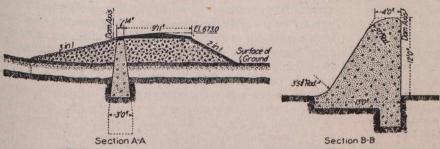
Sections of Sooke Lake Dam and Earthfill.
